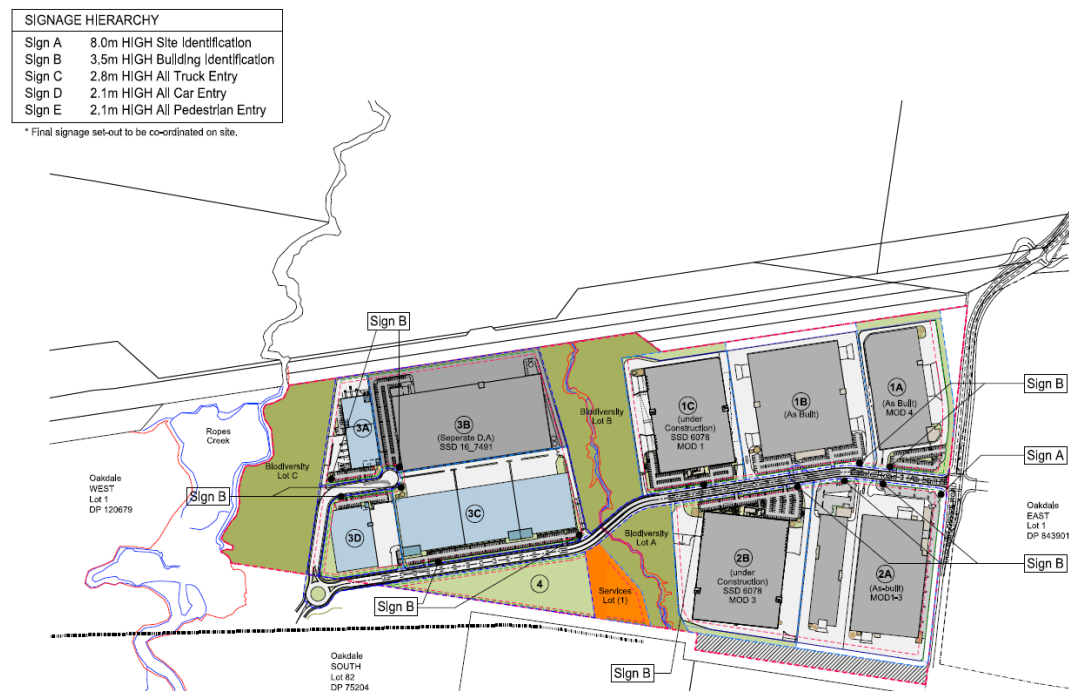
Approved signage plan – Plan OAK 3 DA 05 (N)
